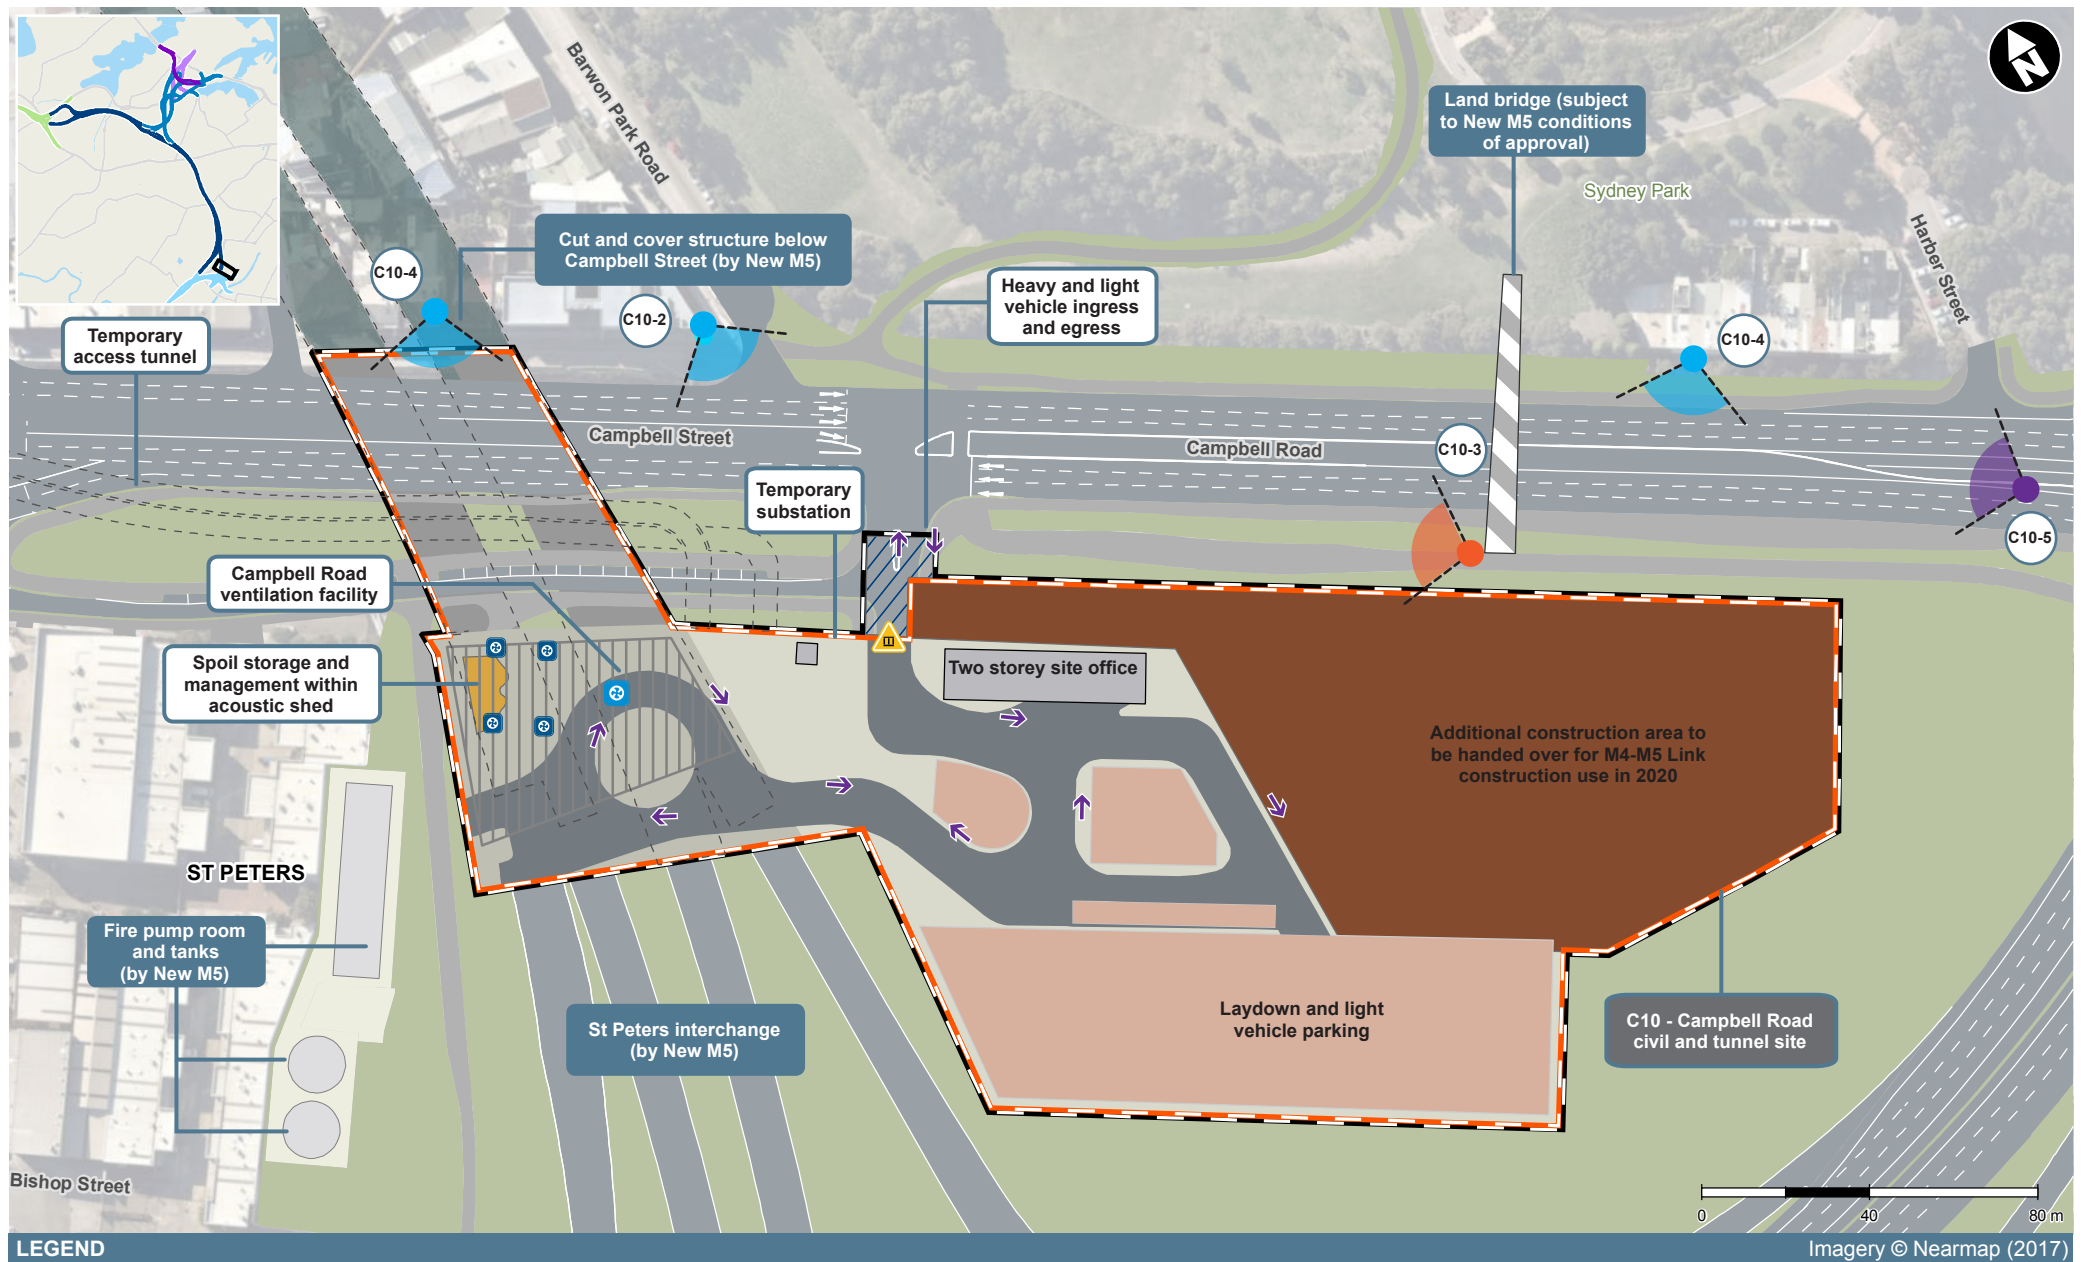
Campbell Road civil and tunnel site (C10) representative receiver locations
